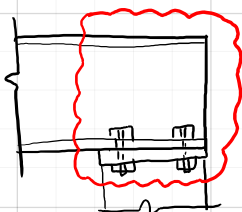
PLATE BENDING CALLSREACTION FRAME CONNECTION (TOP)W8 x 24
